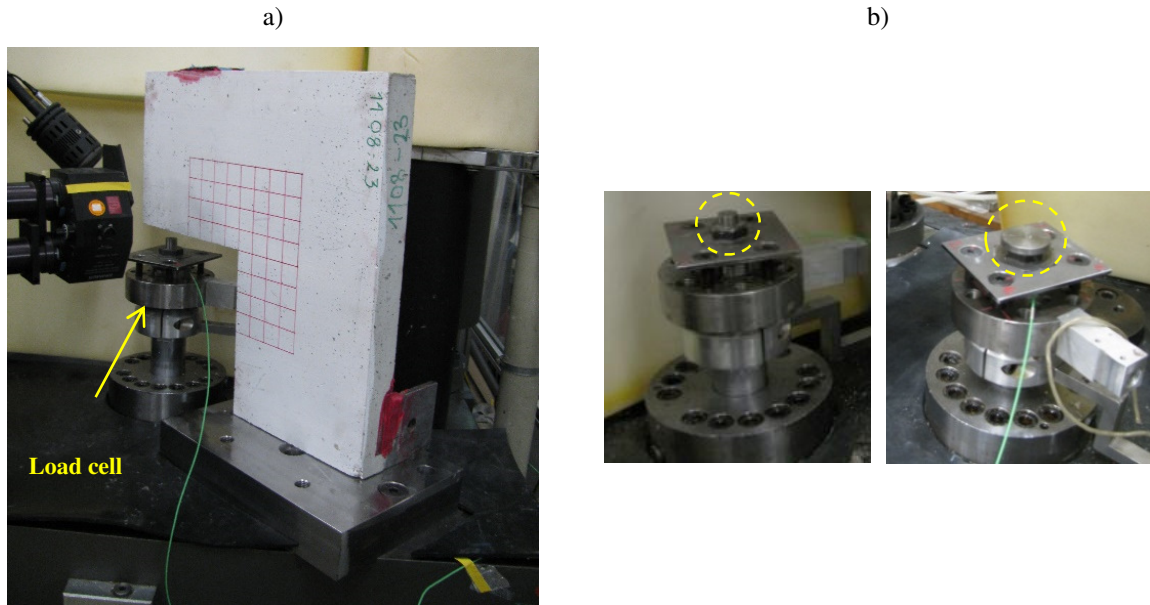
Photo of a) load cell arrangement and b) detail of striking end of load cell: steel cylinder with diameter contact area $2R = 20$ mm (left) and $2R = 45$ mm (right).
